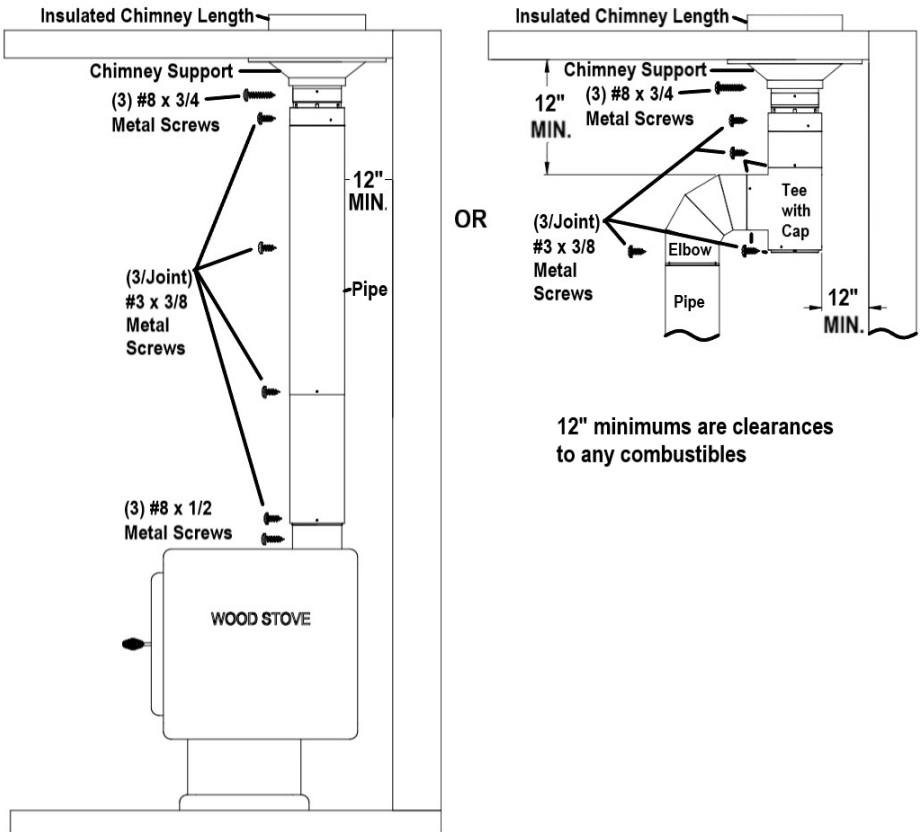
DW Chimney Connector to Vertical Insulated Chimney Installation
